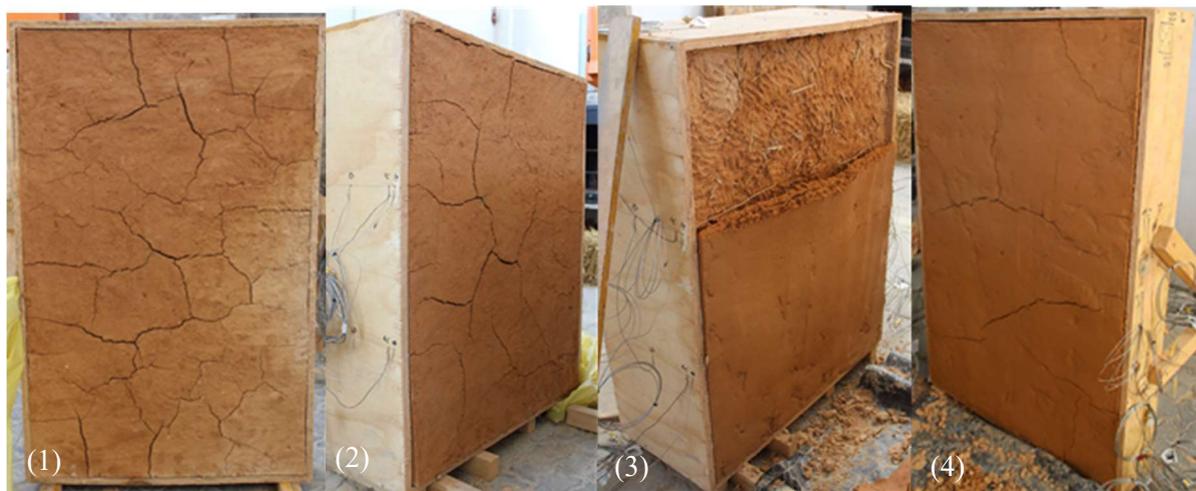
Problems encountered during the wall sample assembling process showing the result of cob plaster shrinking which caused cracking and delamination
